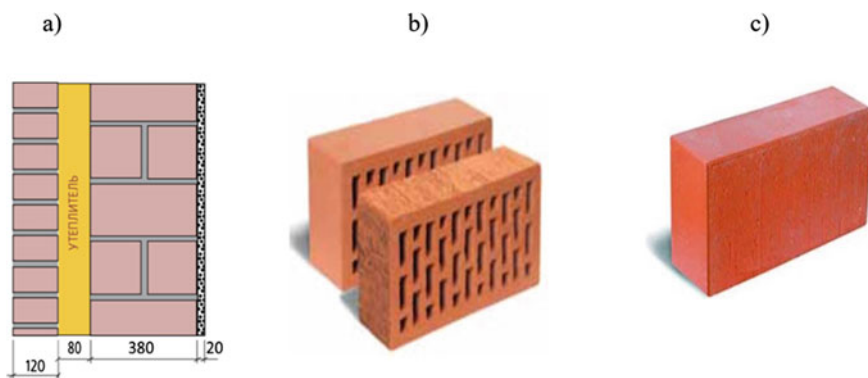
Scheme of a three-layer wall structure made of ordinary clay brick 380 mm thick with mineral wool insulation and a facing outer layer 120 mm thick (a) made of hollow face brick (b) and ordinary clay brick (c)
